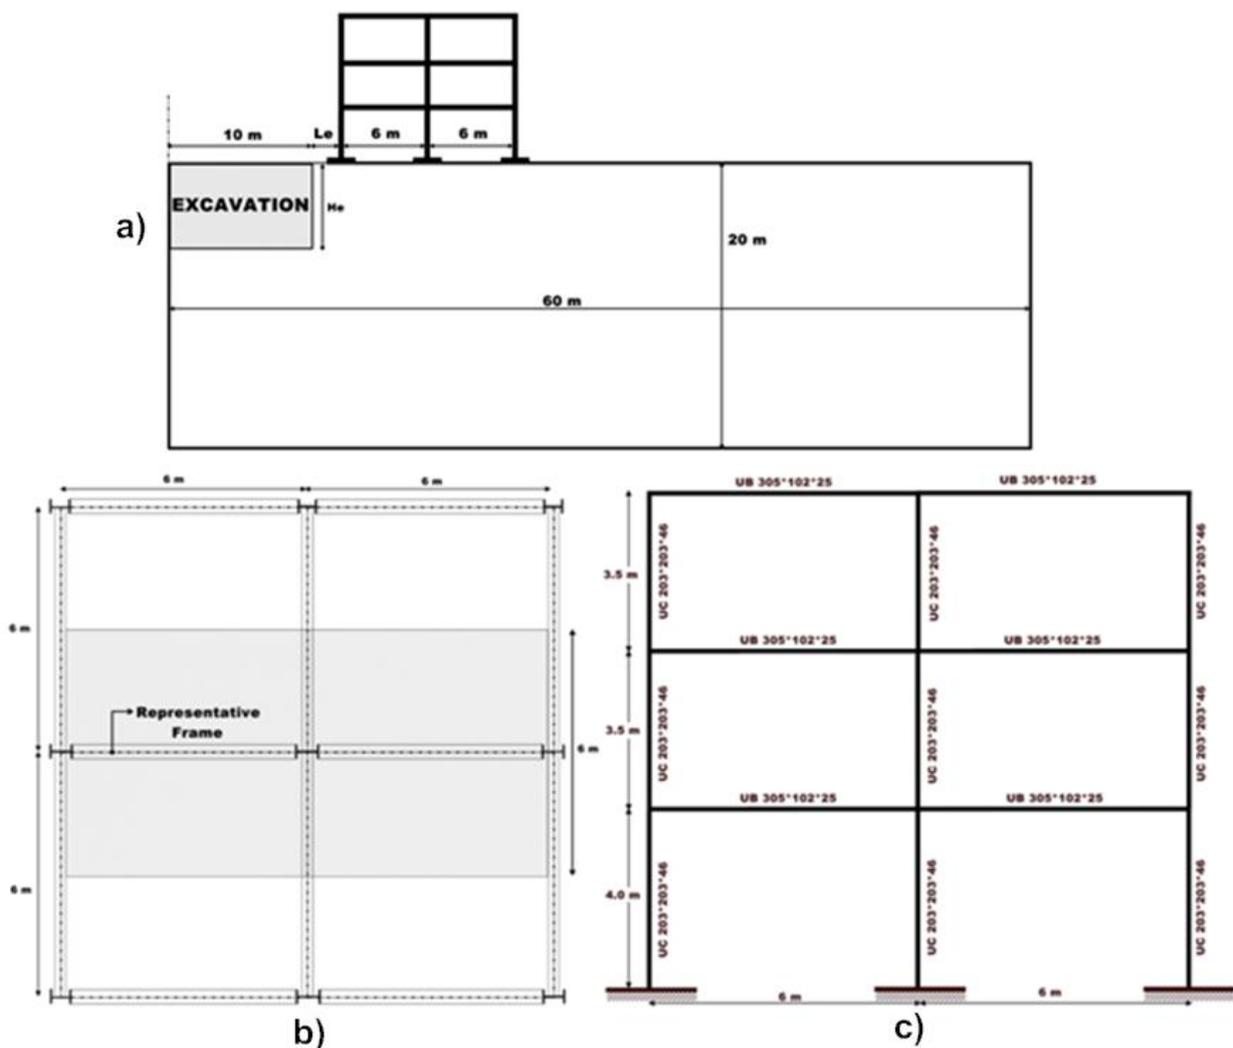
SSI case overview a) Plane frame resting on soil subject to ground excavation b) Plan view of considered building c) Geometric configuration of considered frame
